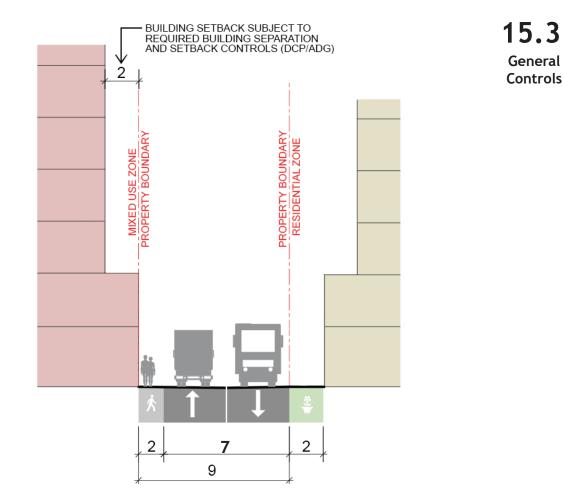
Typical Laneway Section - B4 Mixed-use Zone to R4 Medium Density Residential Zone
